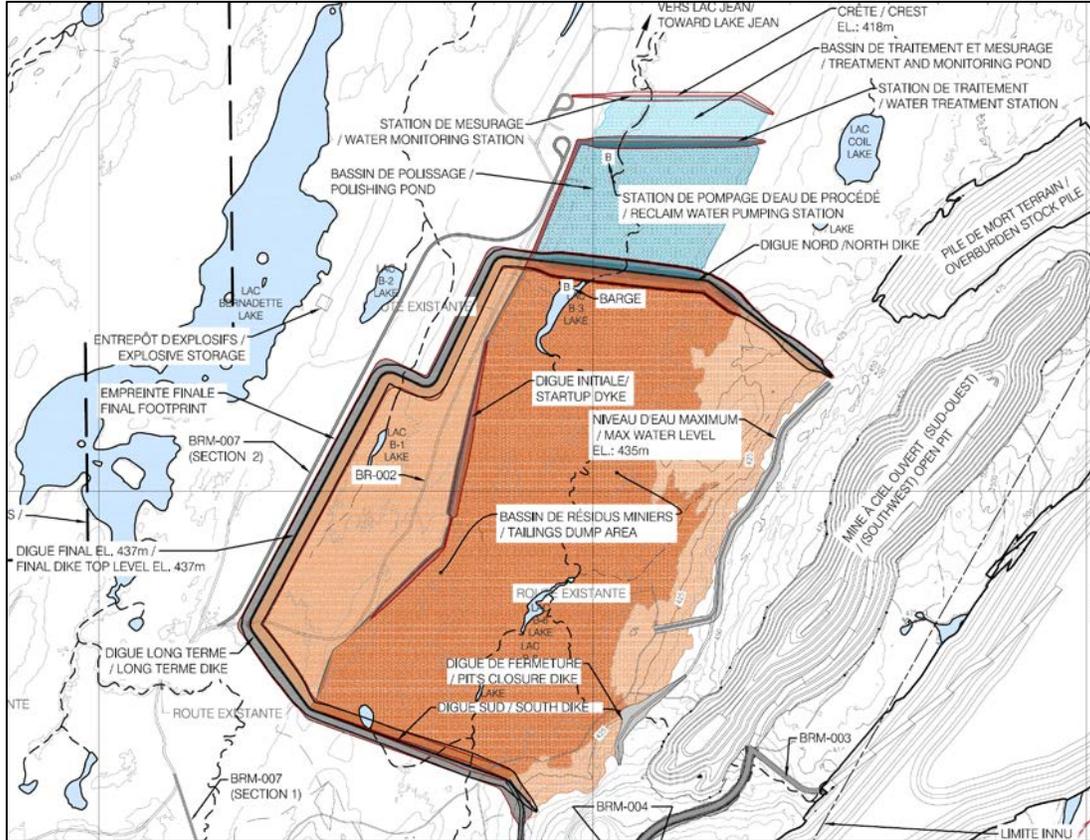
Final Permanent Perimeter Dikes for the Tailings, Polishing and Monitoring Ponds Built
